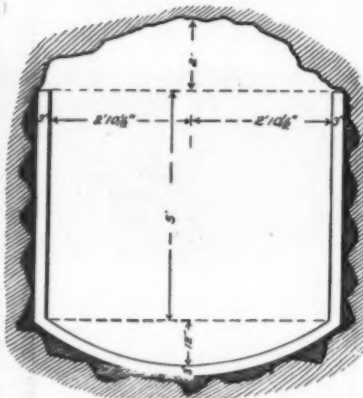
TUNNEL SECTION IN ROCK, SANTA ANA CANAL.
